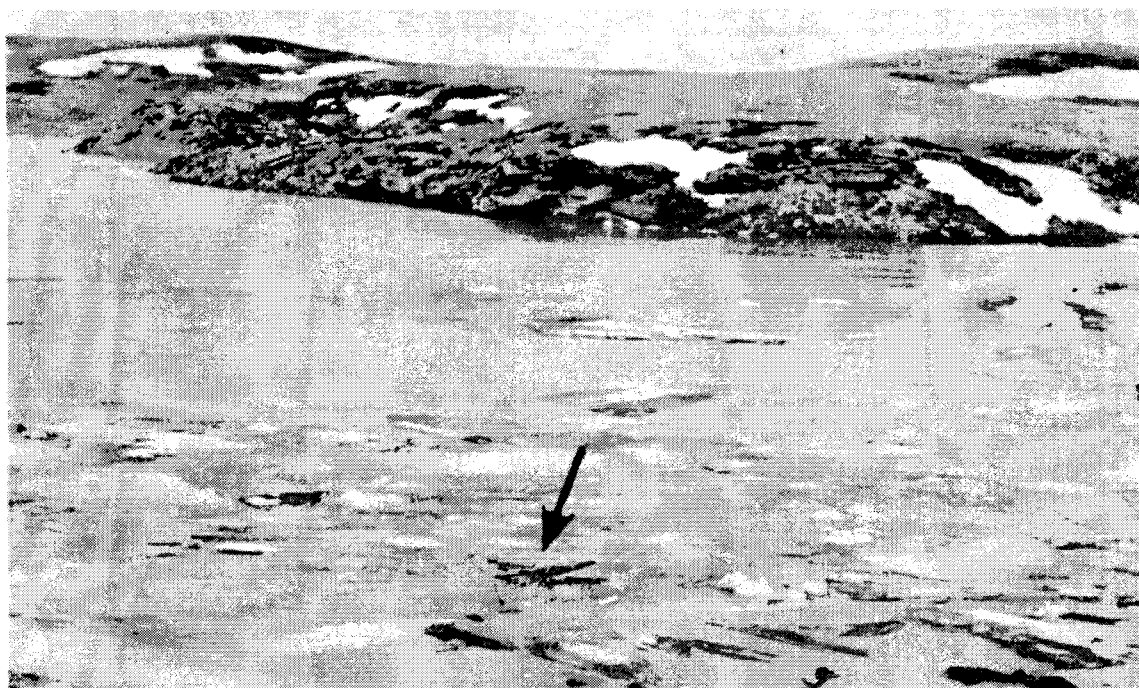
On April 17 the reservoir had risen to elevation 2073.8, submerging the spillway crest to a depth of 9.3 feet at a discharge of 3,250 cfs.
